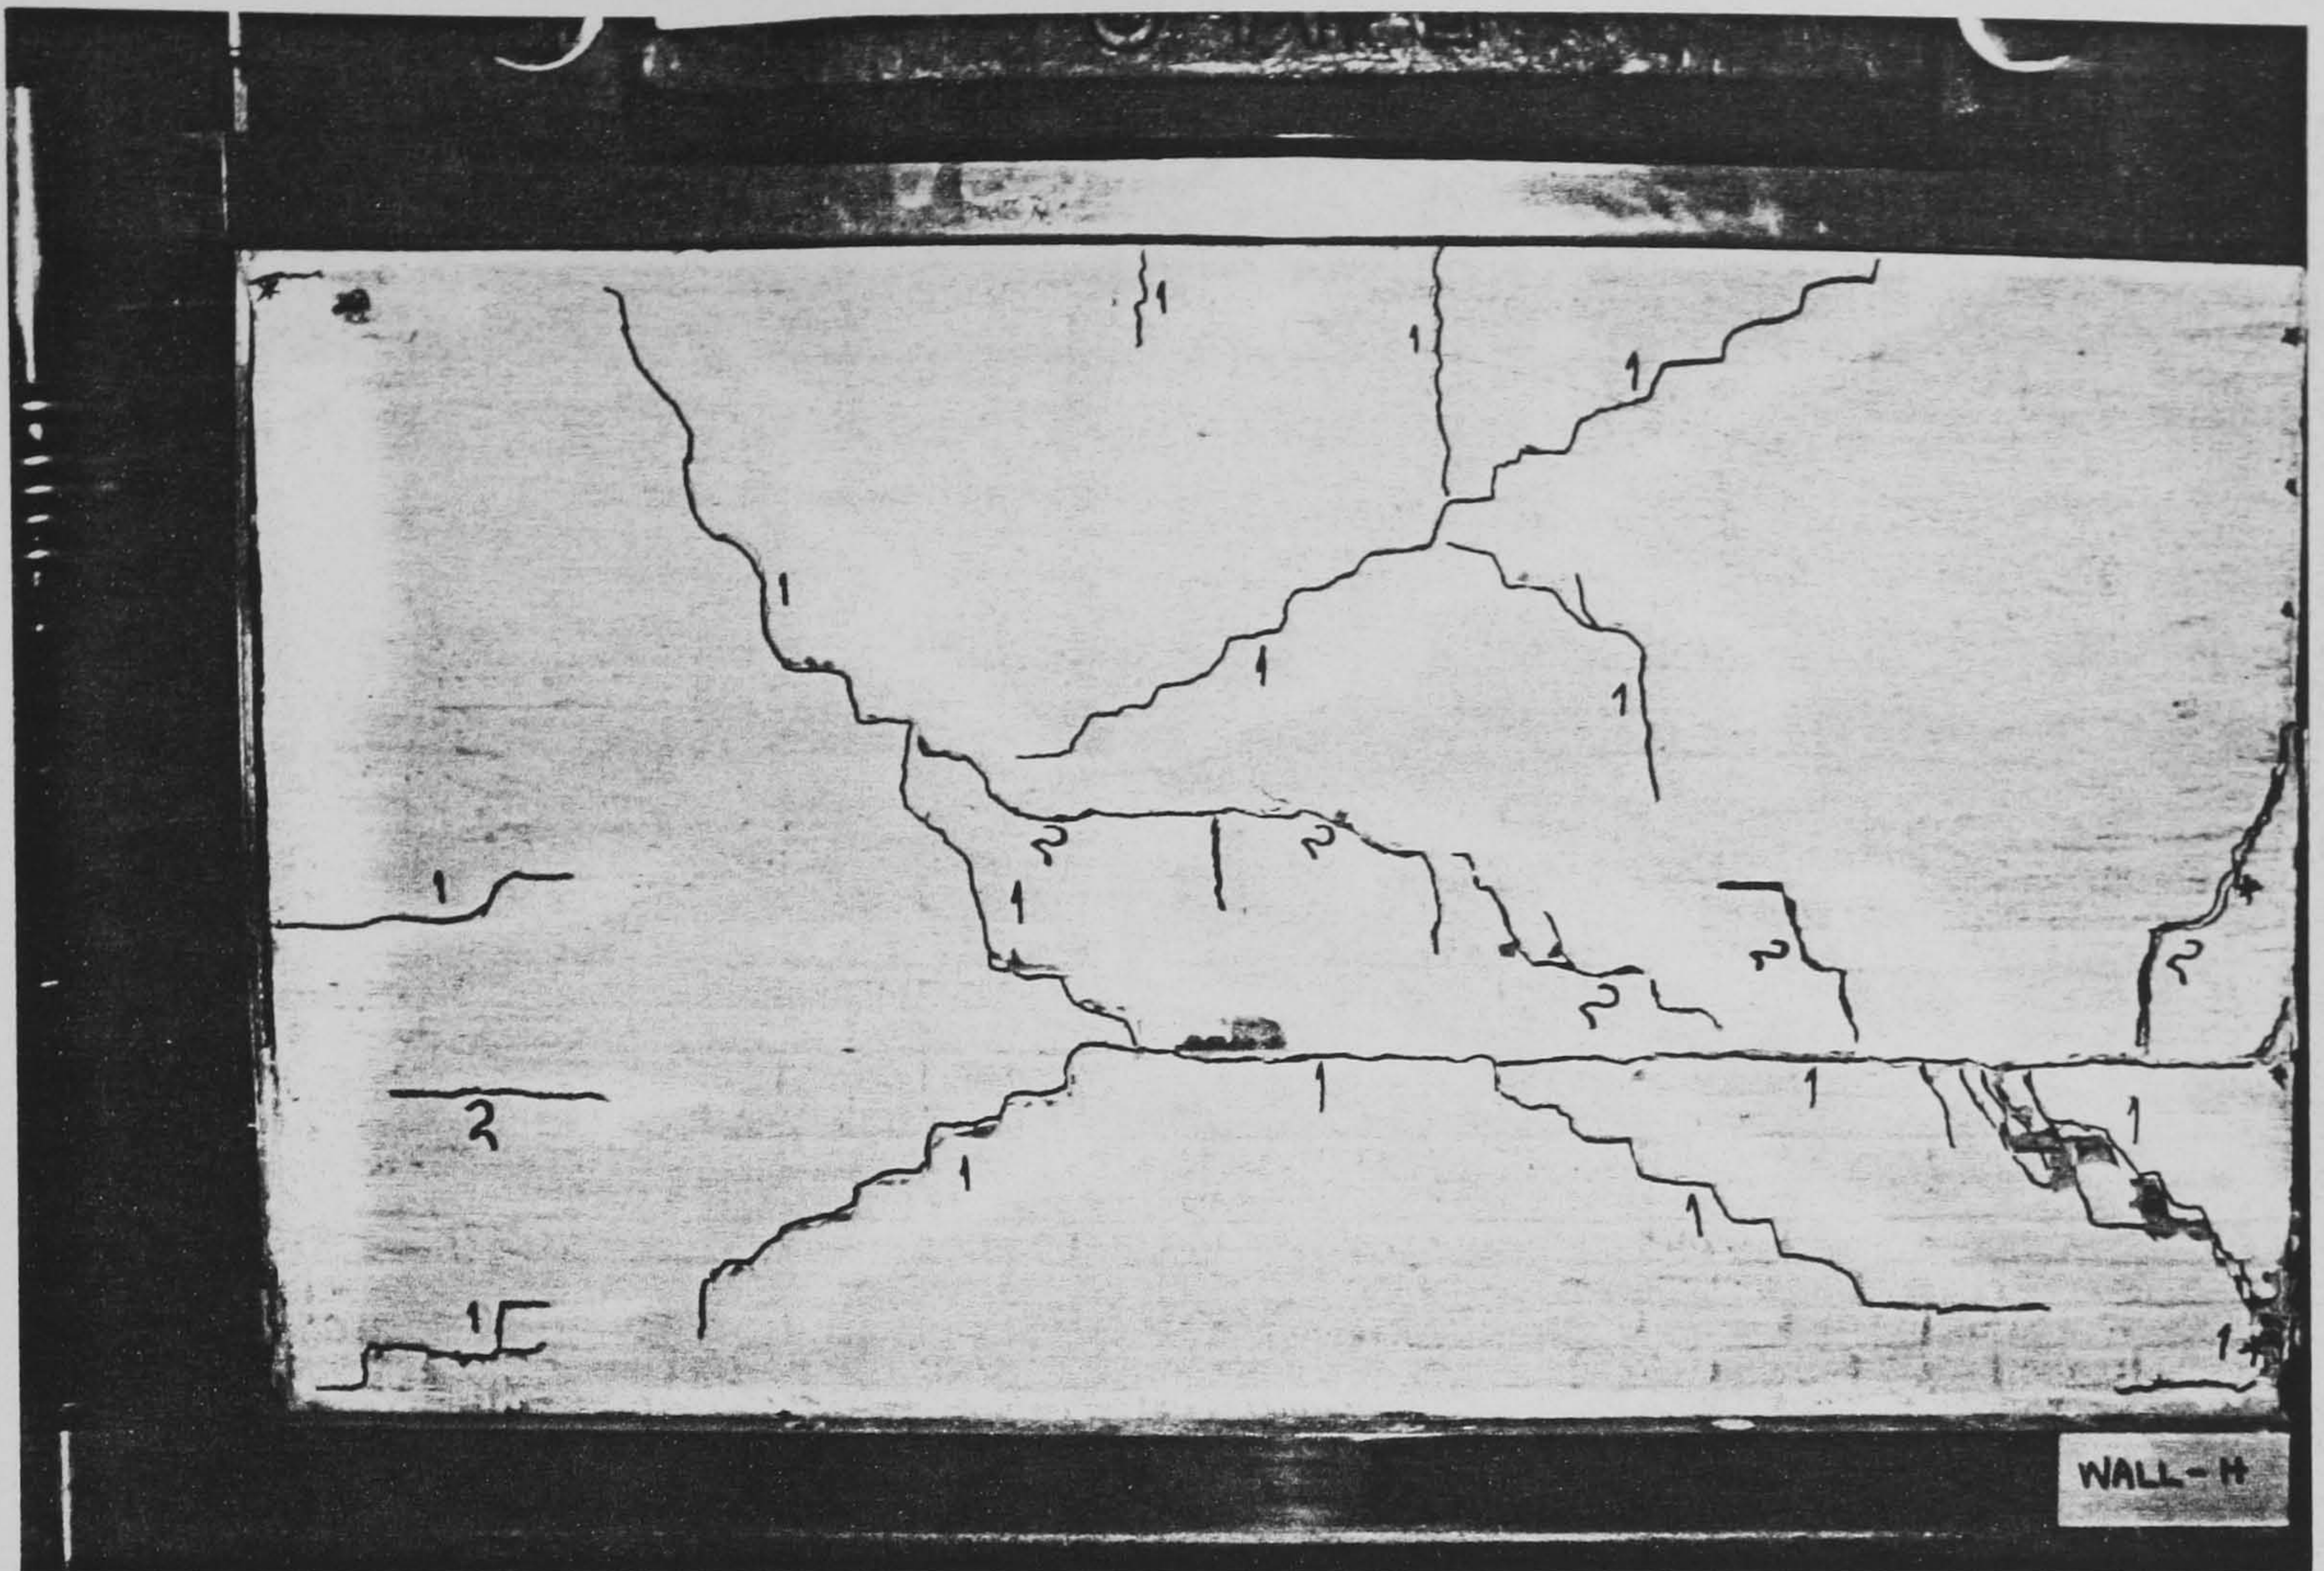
Crack 2 and lower corner crushing (wall-H)
